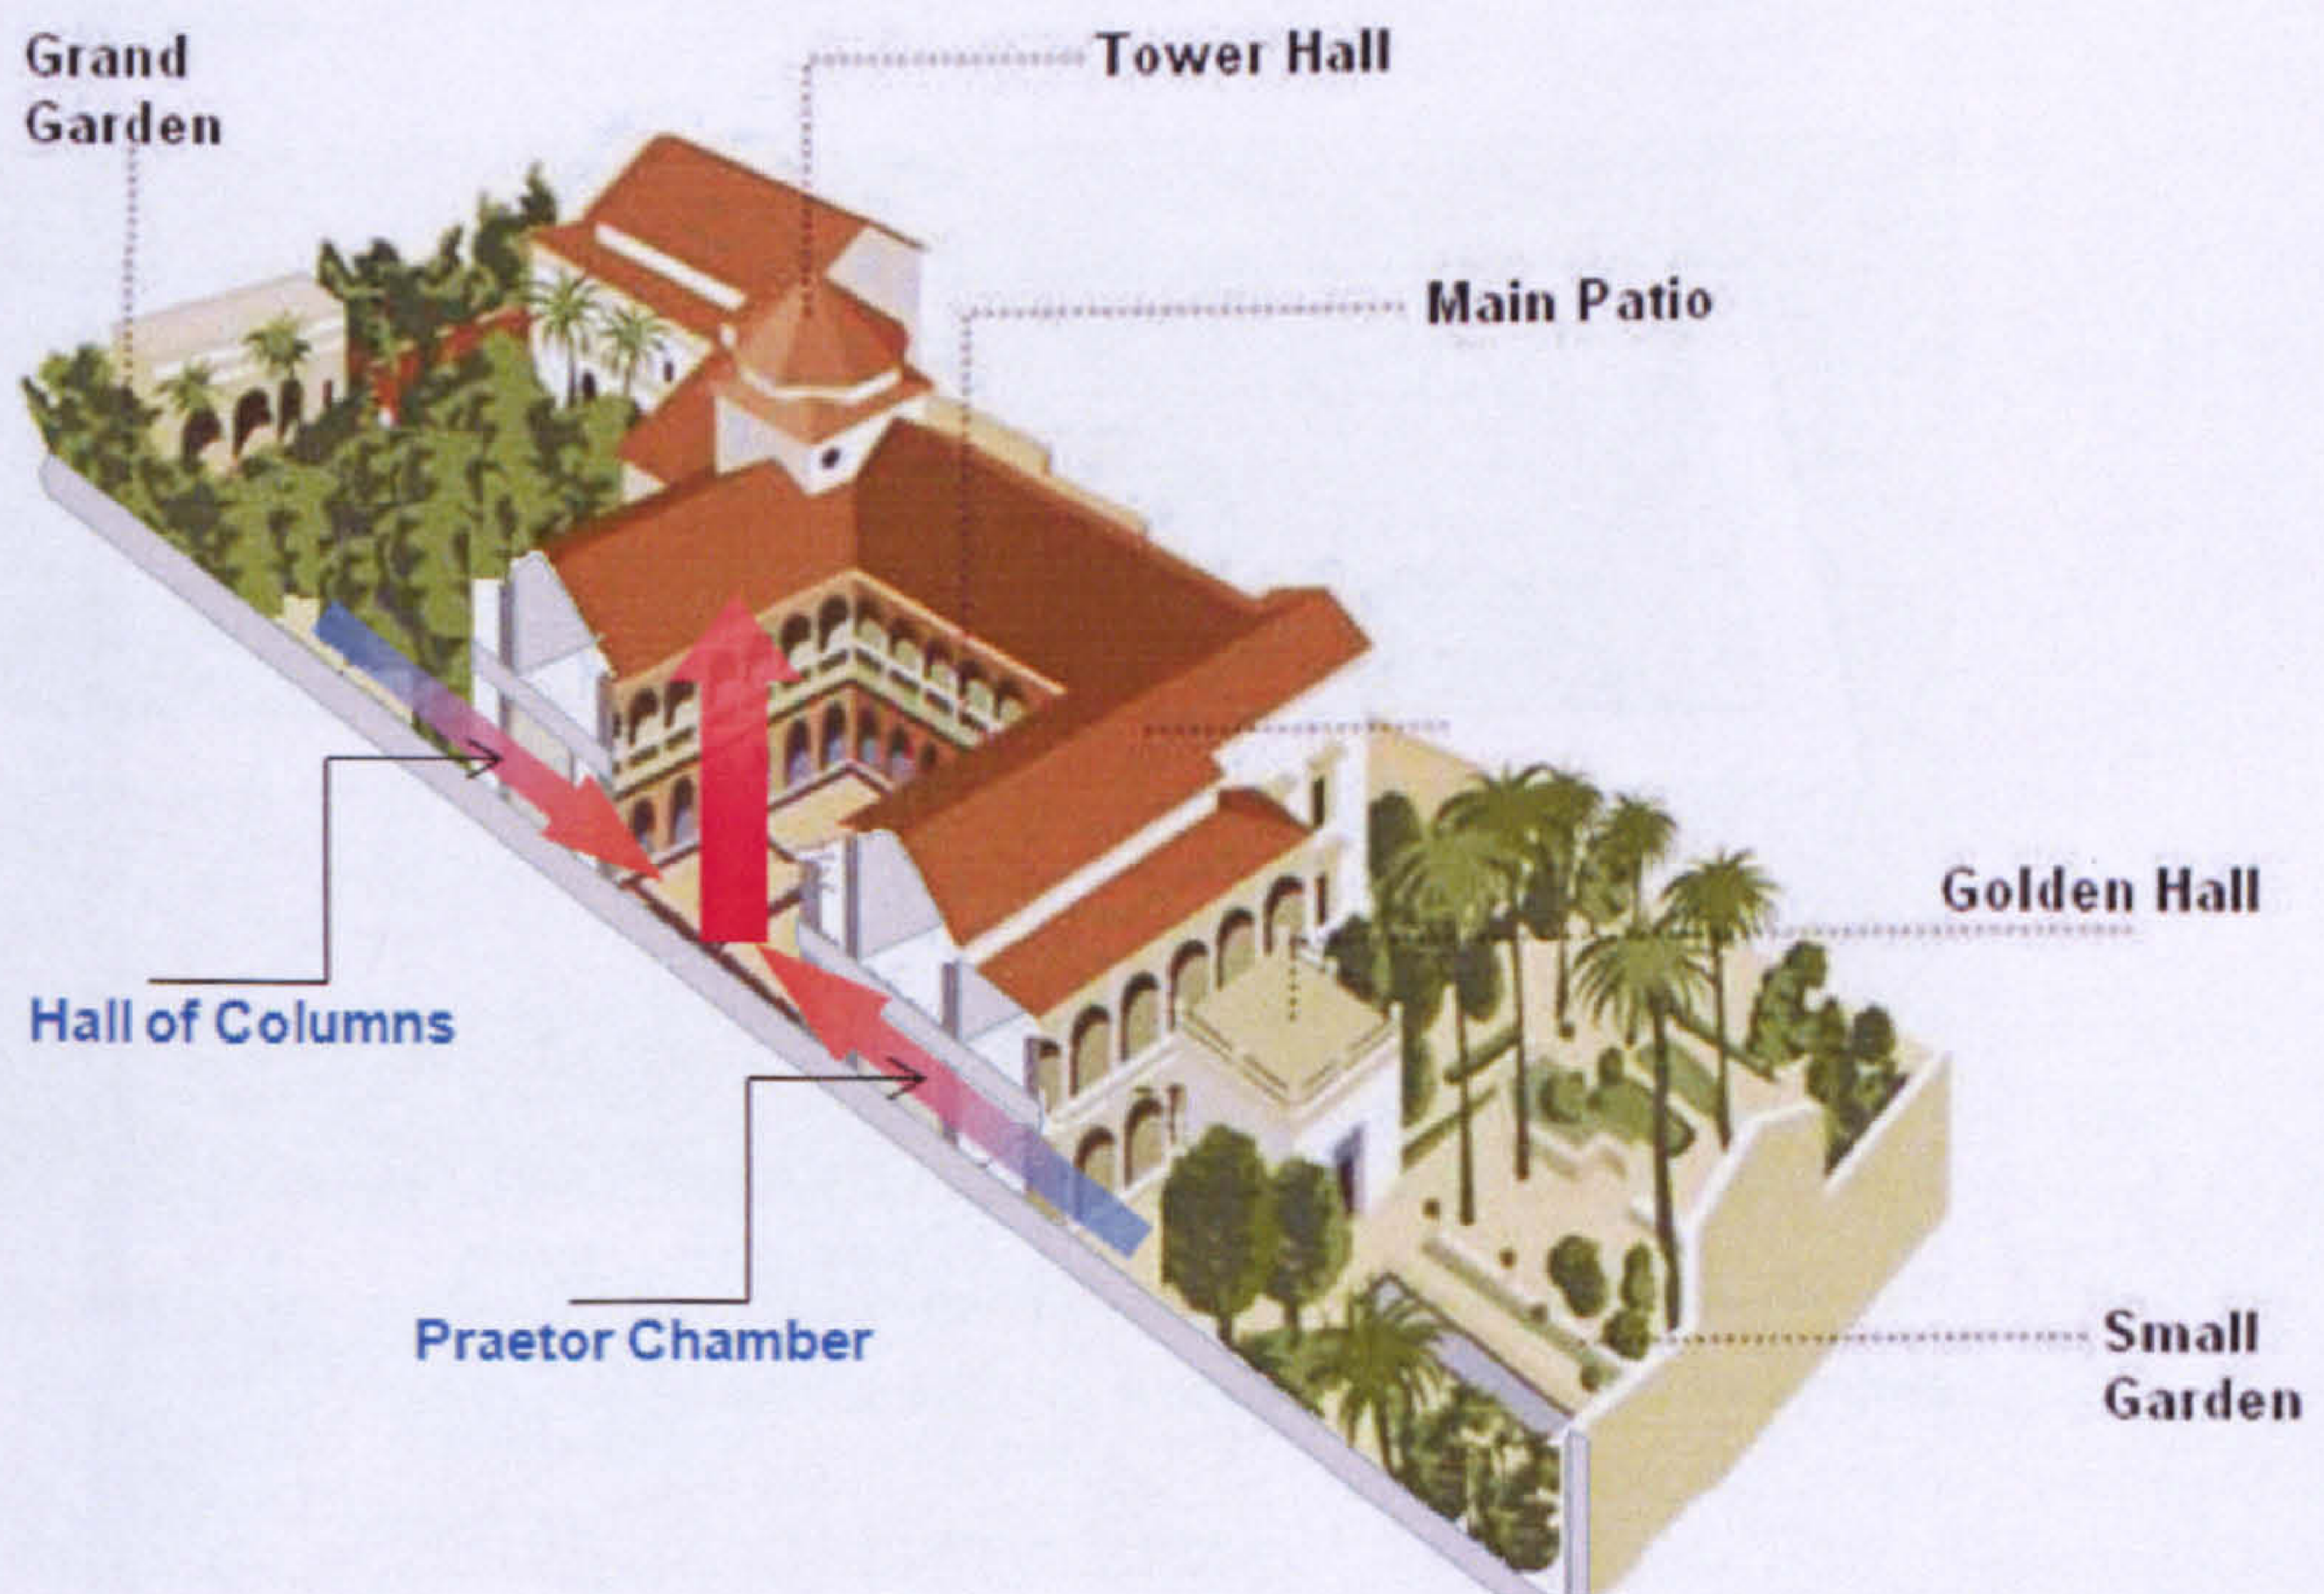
Cross section of the Casa de Pilatos showing the transitional spaces; Source: modified from agbeaver.com
